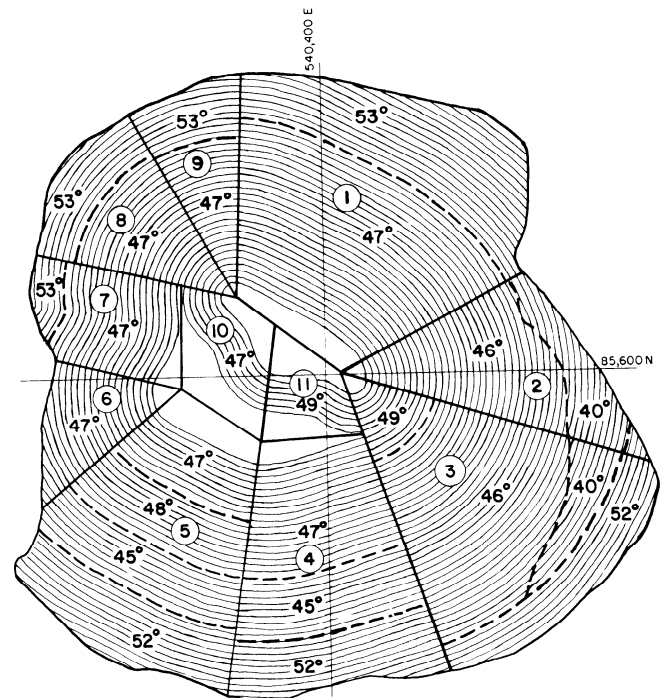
Cuajone design sectors and recommended interramp angles.
